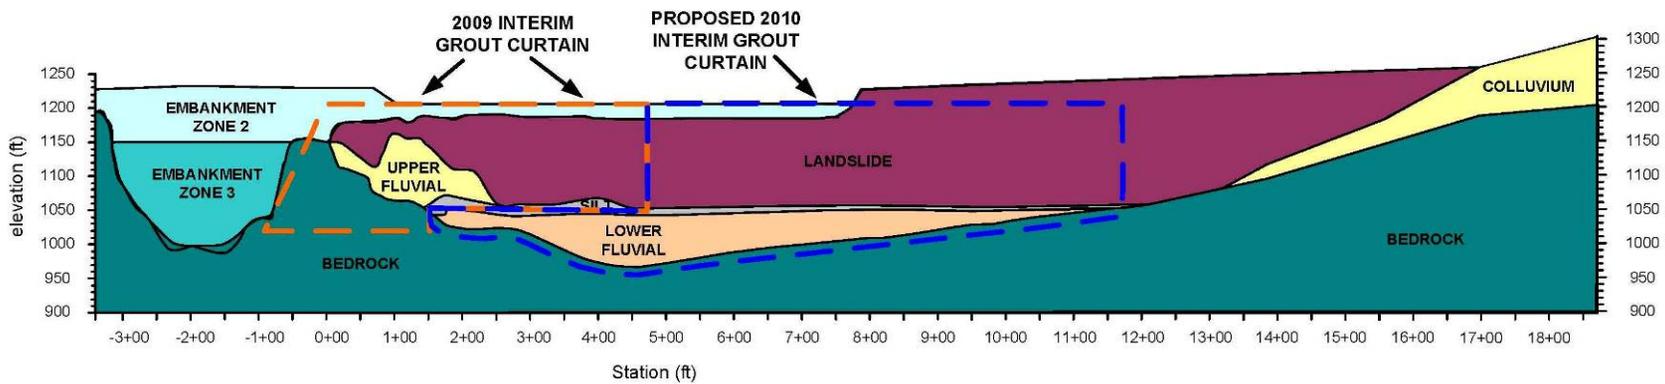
Cross section view of 2009 constructed grout curtain (orange) and proposed 2010 grout curtain (blue).
